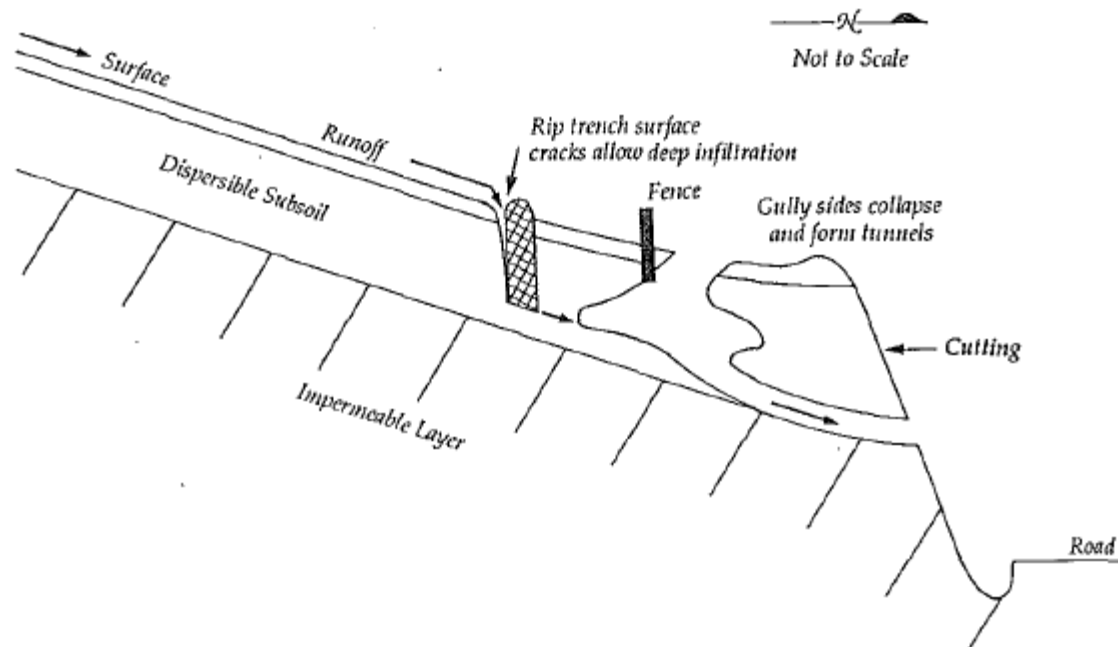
FORMATION OF A TUNNEL - GULLY FROM FENCELINE TO ROAD (MT29 Sheet 5)
